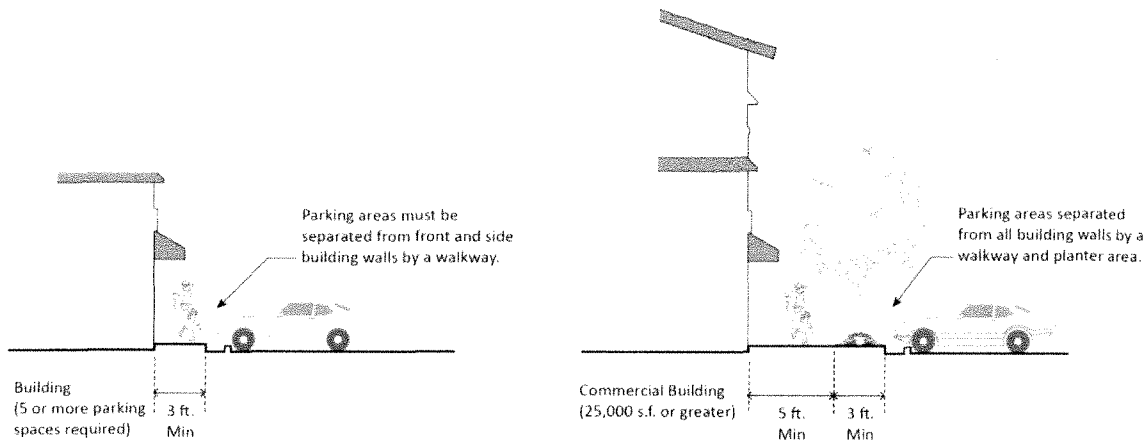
K: PARKING SEPARATION FROM ON-SITE BUILDINGS
